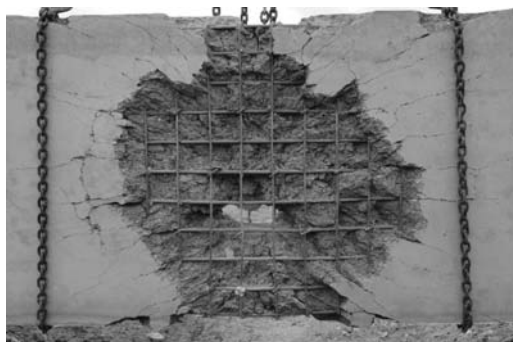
Damaged specimen No. 3 after blast – bottom view.
